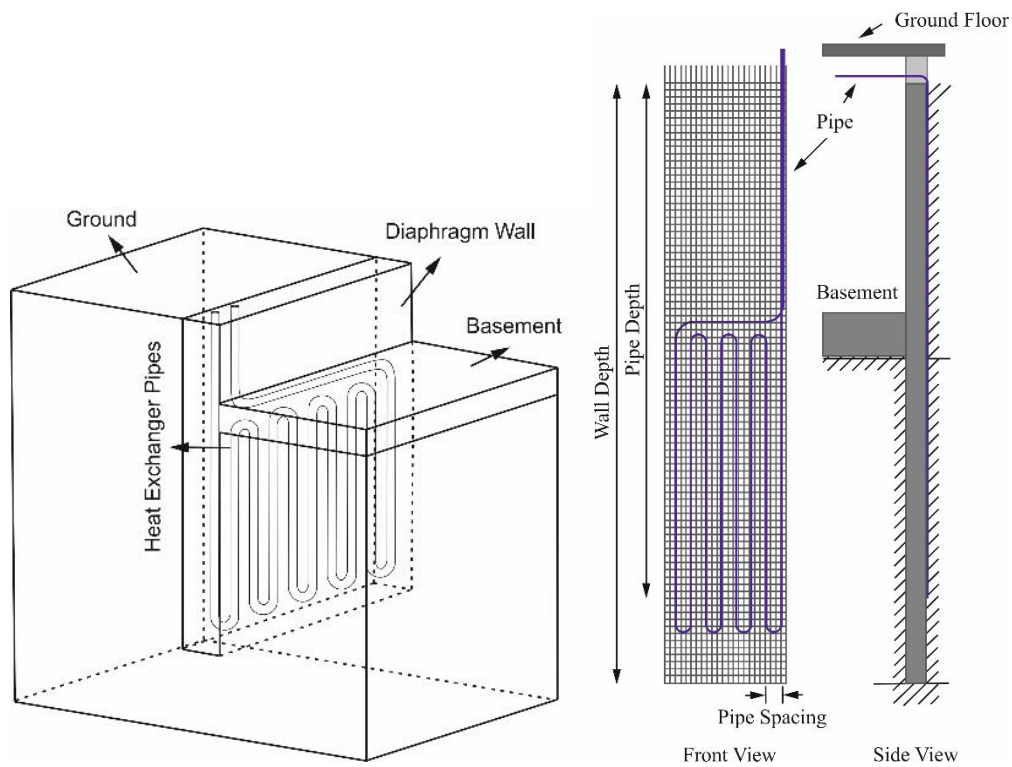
Diaphragm wall heat exchanger with pipes fitted below the basement level [65].
